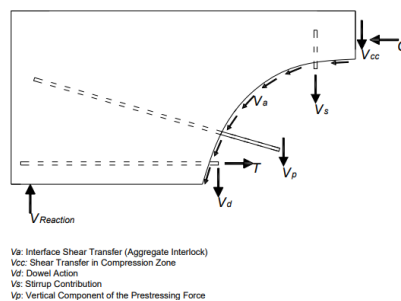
Mechanism of shear transfer in cracked prestressed beam [43]
